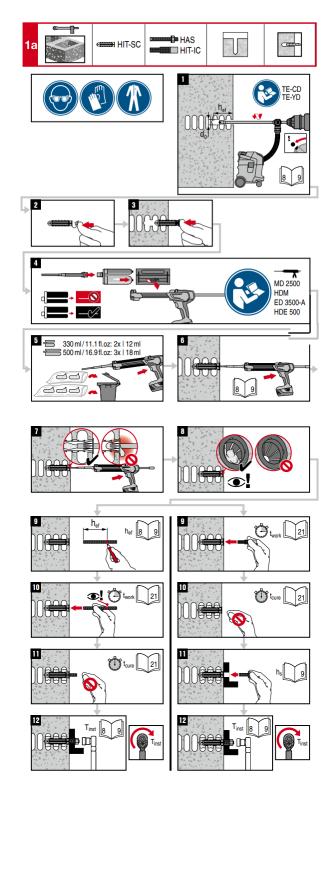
MANUFACTURERS PRINTED INSTALLATION INSTRUCTIONS
